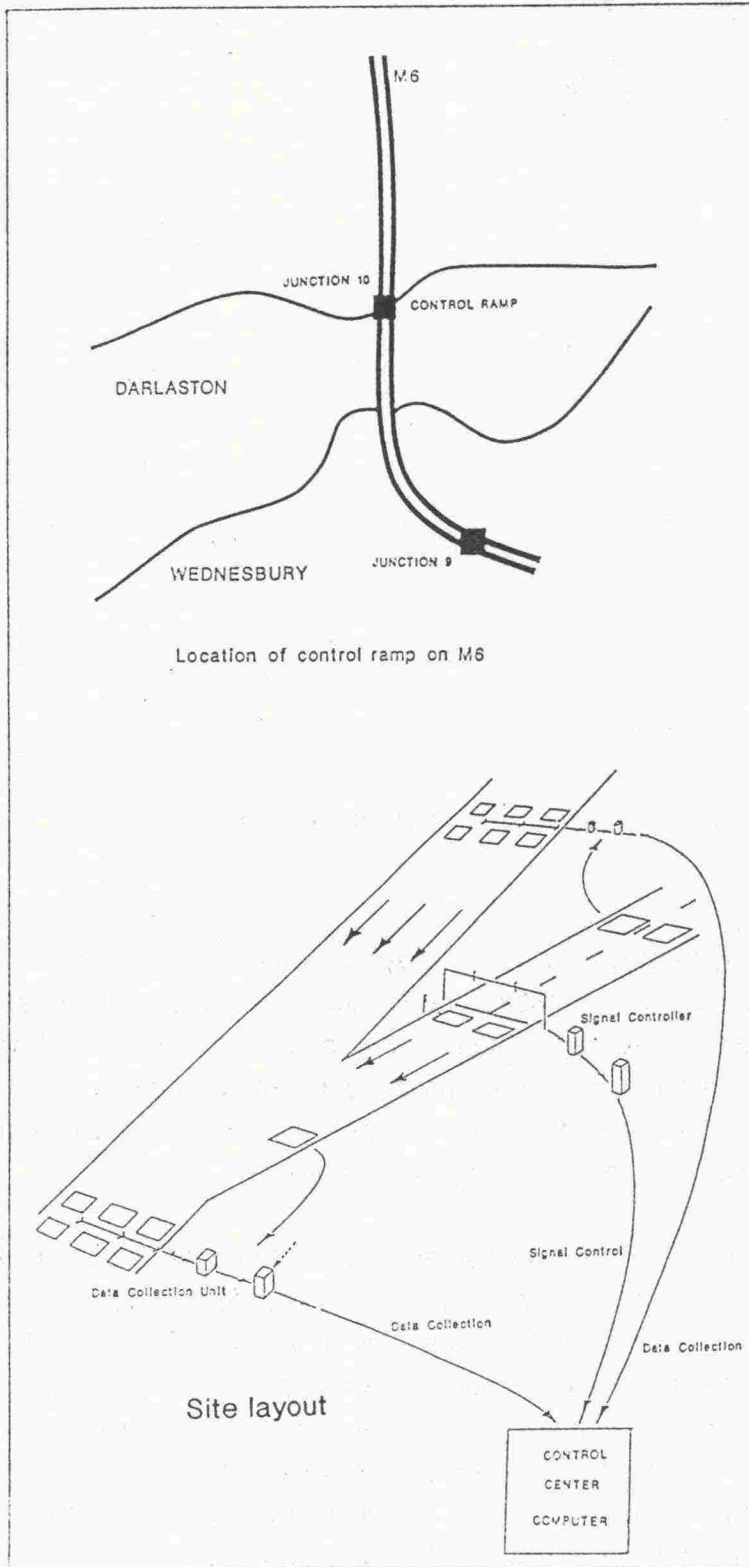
Layout of Birmingham ramp metering site on M6
